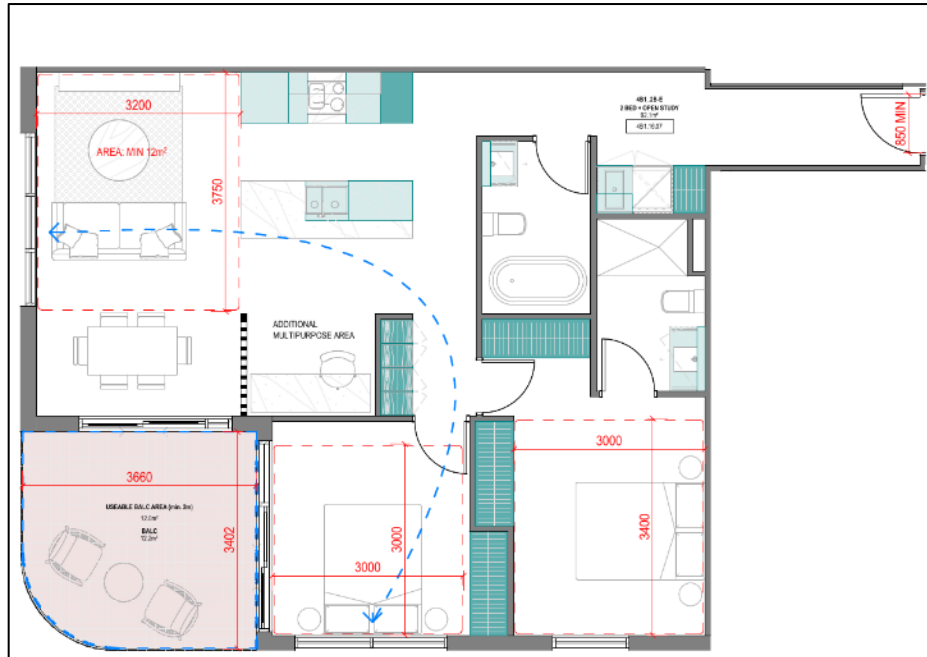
Example of apartment layout which does not meet the minimum living area width requirement however is compensated with additional floor area across the apartment (source: Architectural Plans)
